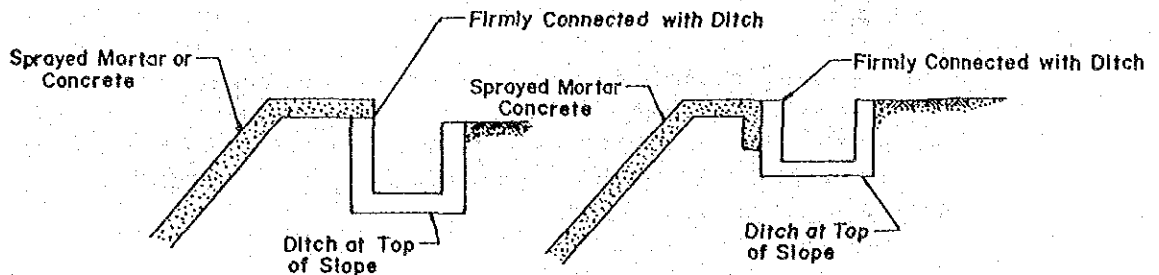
CONNECTION OF SPRAYED CONCRETE WITH DITCH
